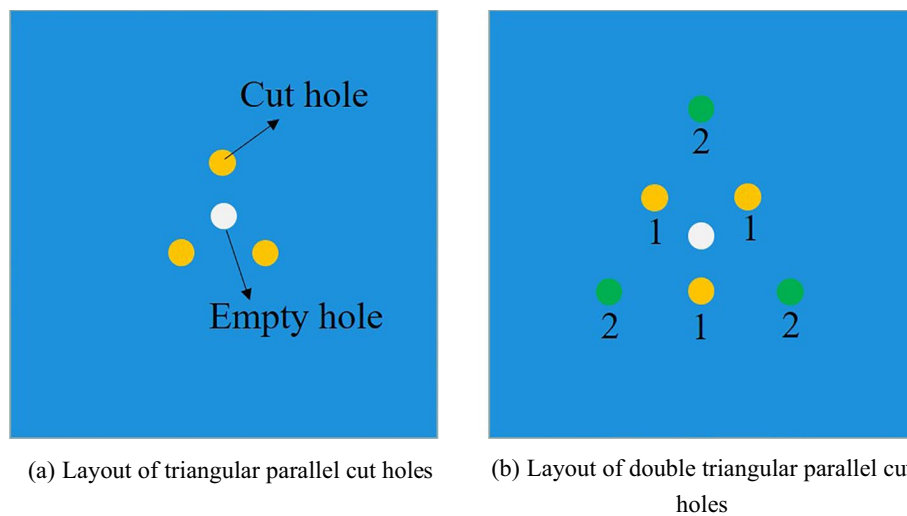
Layout of cut holes. a Layout of triangular parallel cut holes b Layout of double triangular parallel cut holes
